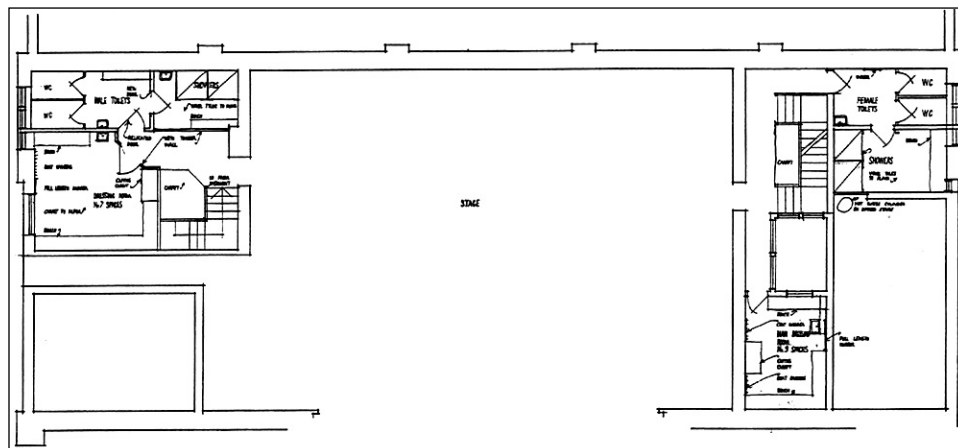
1974 plan of proposed backstage refurbishment (HCC 7410 B3).
